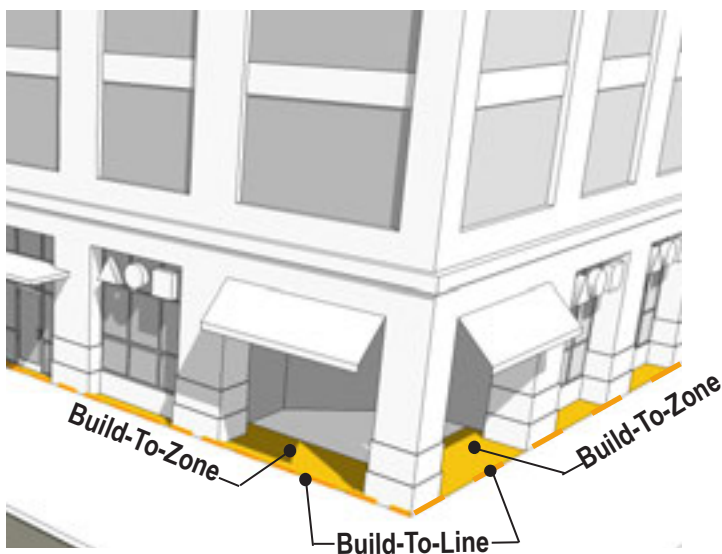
Street Frontages showing a typical Ten Foot Build-To-Zone on an A-street, and a typical Fifteen Foot Build-To-Zone on B Street
